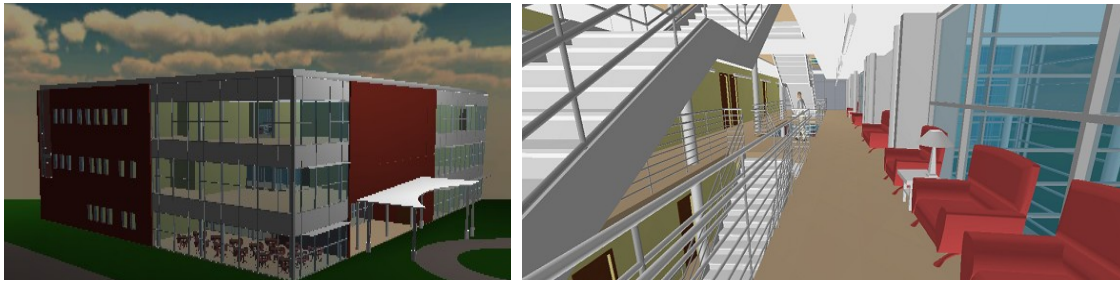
EVA building exterior and inside view (Silva, 2013)
